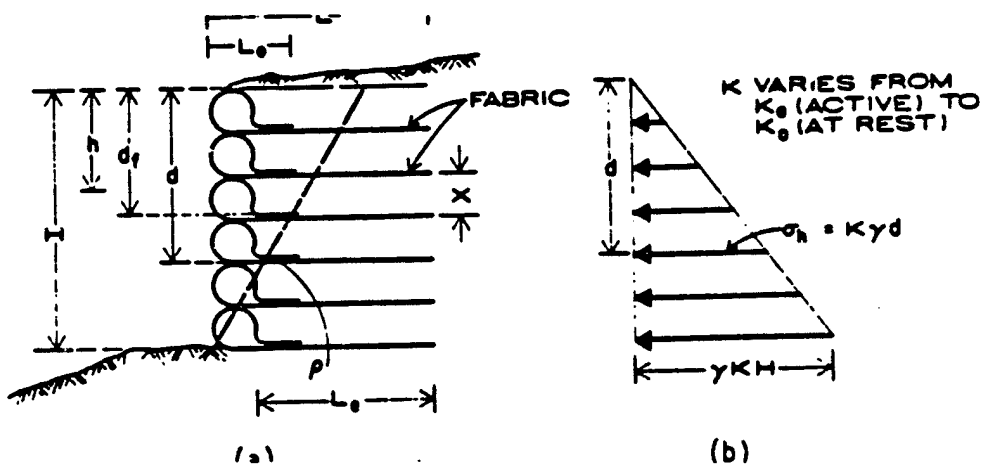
Geotextile Wall-Earth pressure distribution (Driscoll, 1979, and Steward et al., 1977).
